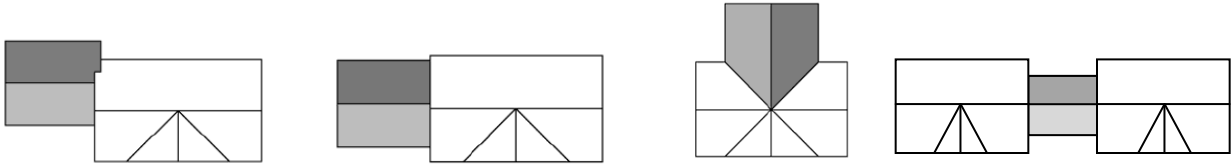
C. Four examples showing appropriate methods of locating an addition on an building, to the side and rear. (New addition shown shaded.) Each example builds off from the original building in such a way that it is offset from the existing facades slightly, which helps integrate it with the scale and character of the original building.
